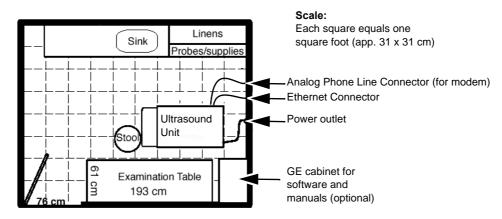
Minimal Floor Plan, 2.5m x 3m (8 by 10 foot)
